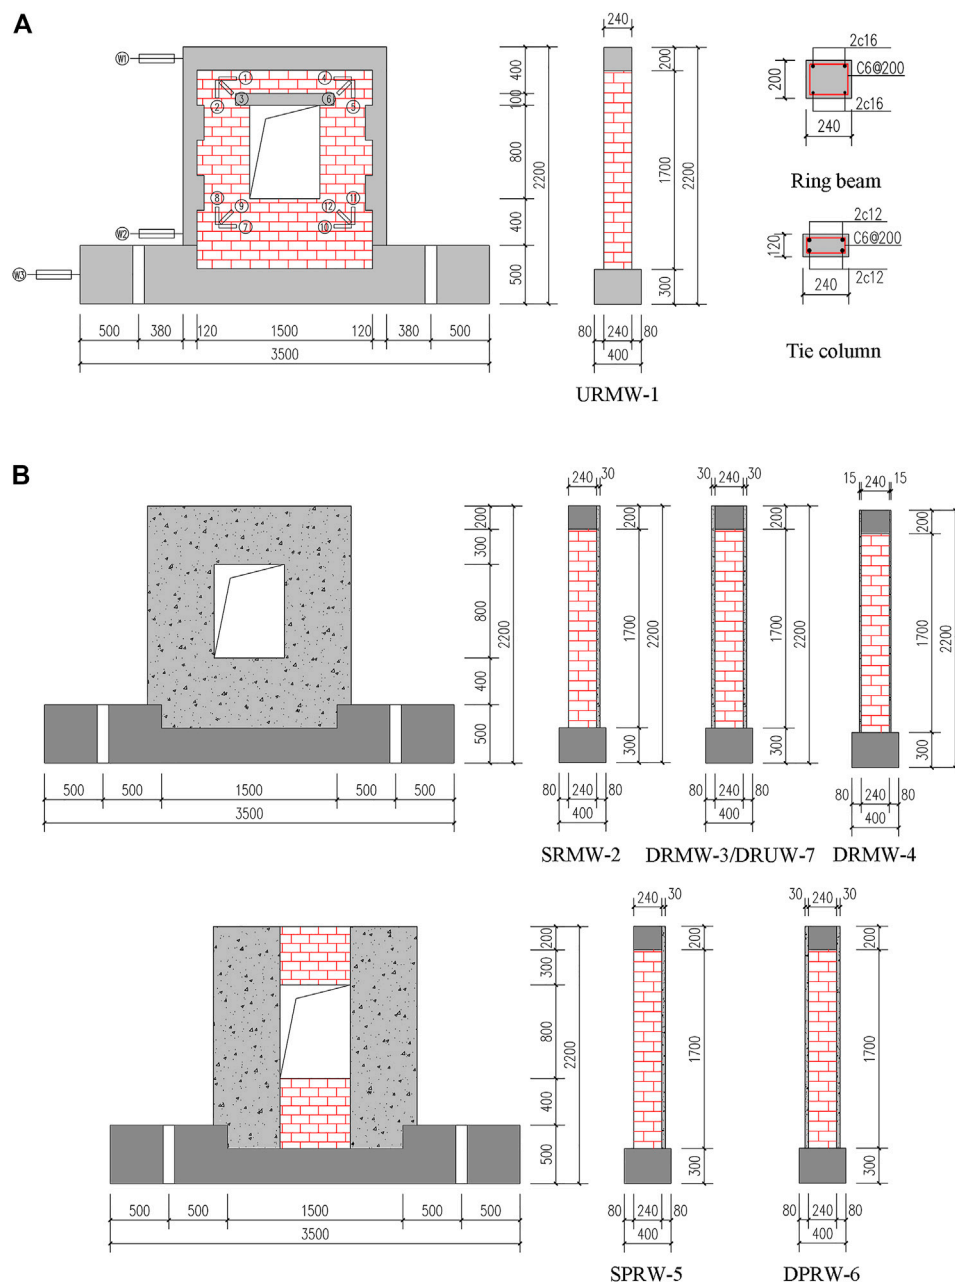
| Details of the tested wall (unit: mm) (A) the layout, reinforcement, and facades of tested walls (B) strengthening methods for the tested walls.
